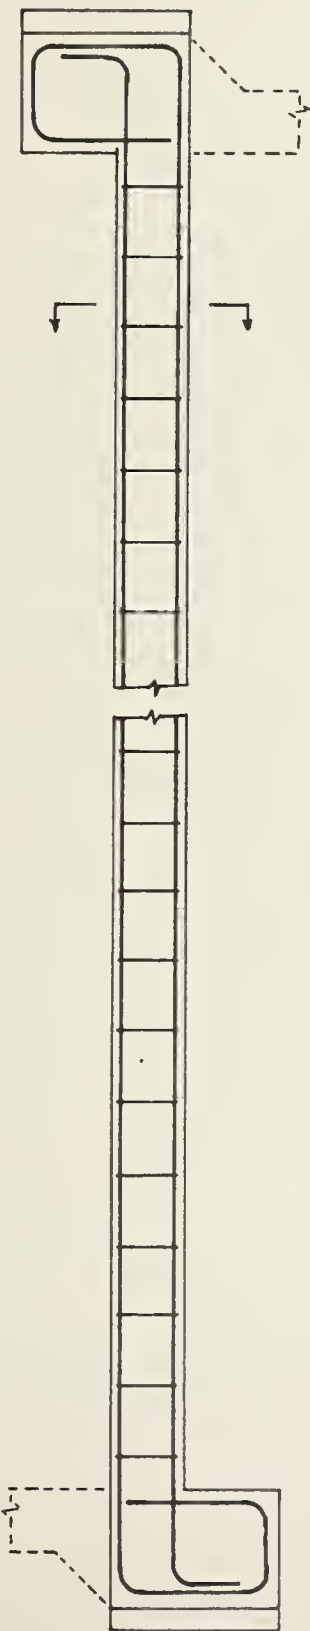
TEST SPECIMEN DIMENSIONS
